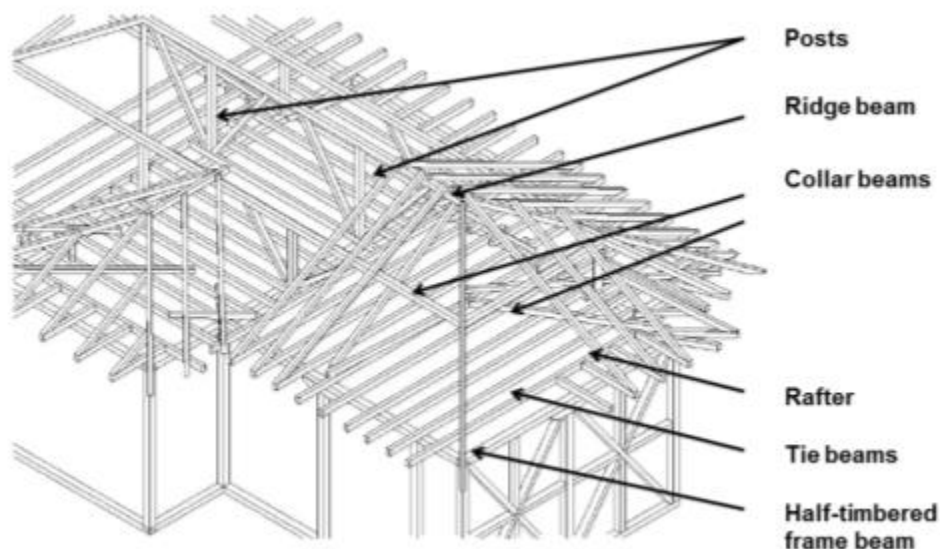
Axonometric configuration of the wooden frame structure of the roof [11].
